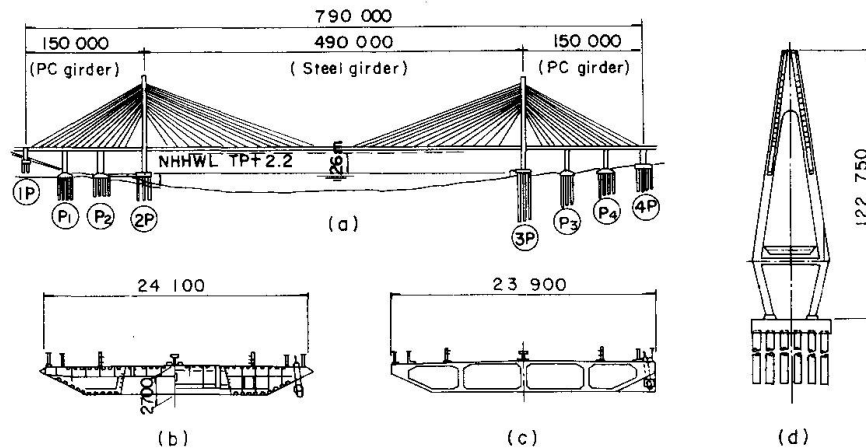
Ikuchi Bridge : (a) Side view (b) Steel girder section,
